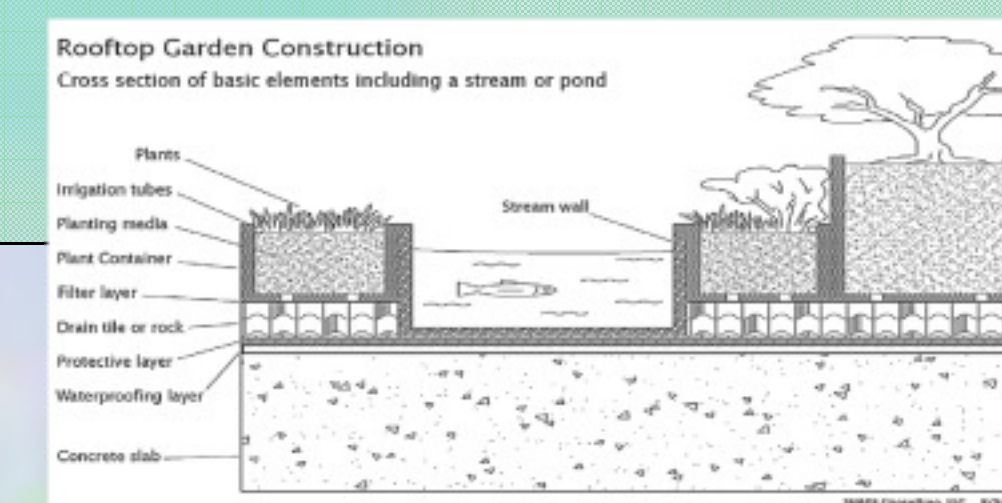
A detailed diagram illustrating the basic construction of a "rooftop garden" or intensive green roof
